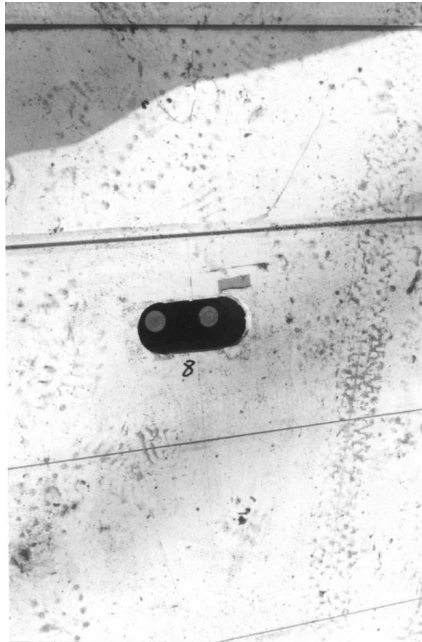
FRP deck during construction to show the connection with the girders.
